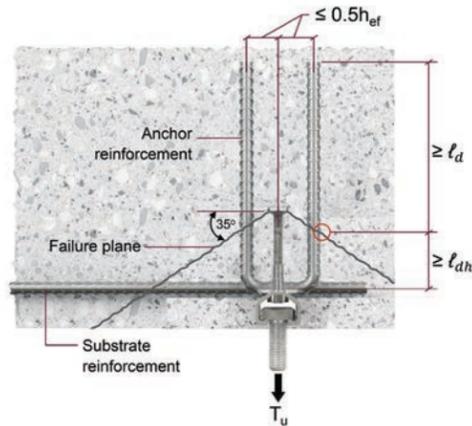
Arrangement of anchor reinforcement for anchor channels loaded by tension load at an edge.
